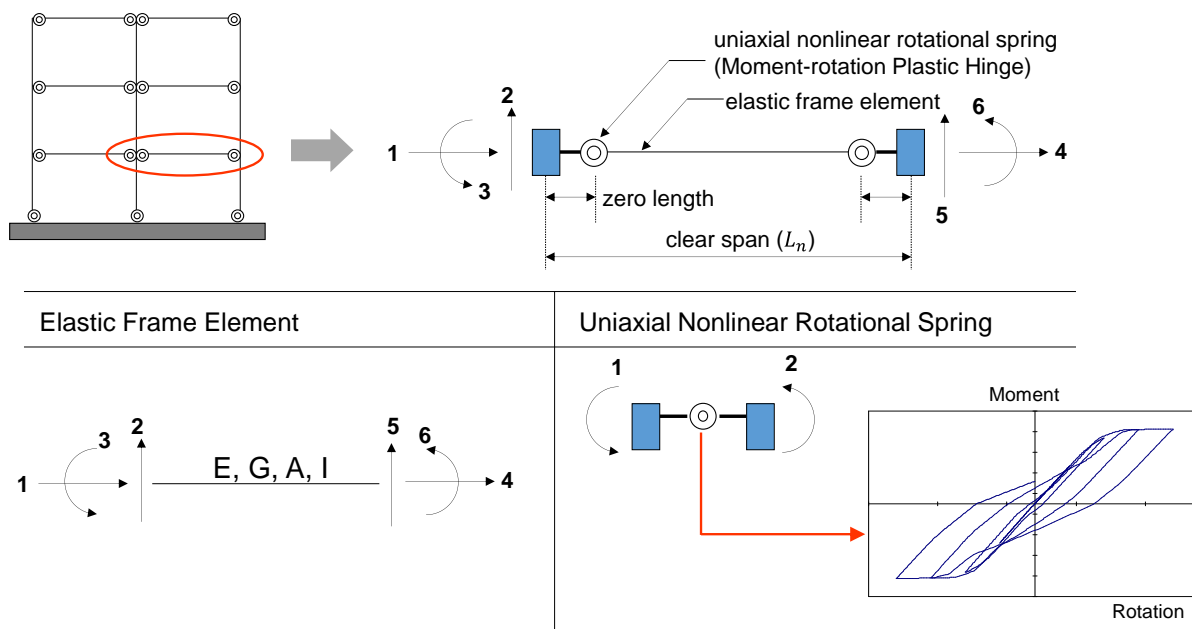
A 2-hinge beam element as compared to an elastic beam element.
